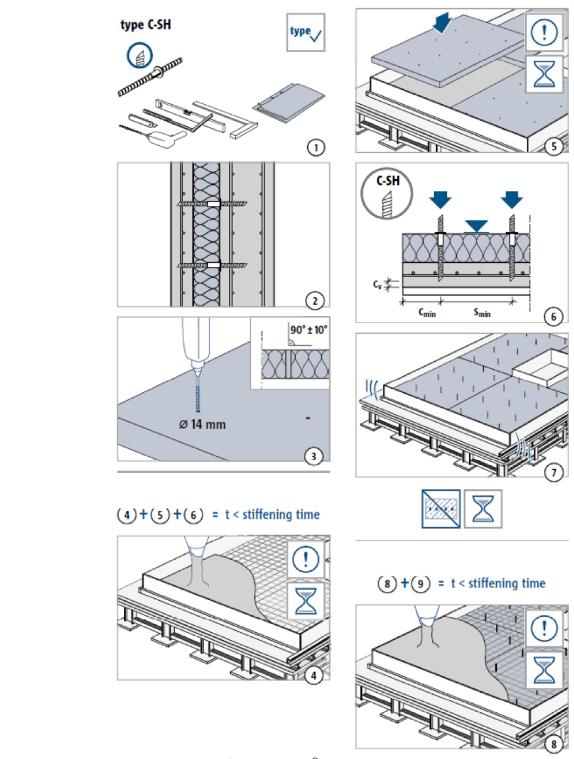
Installation instruction - Schöck Isolink® for sandwich wall - page 1
